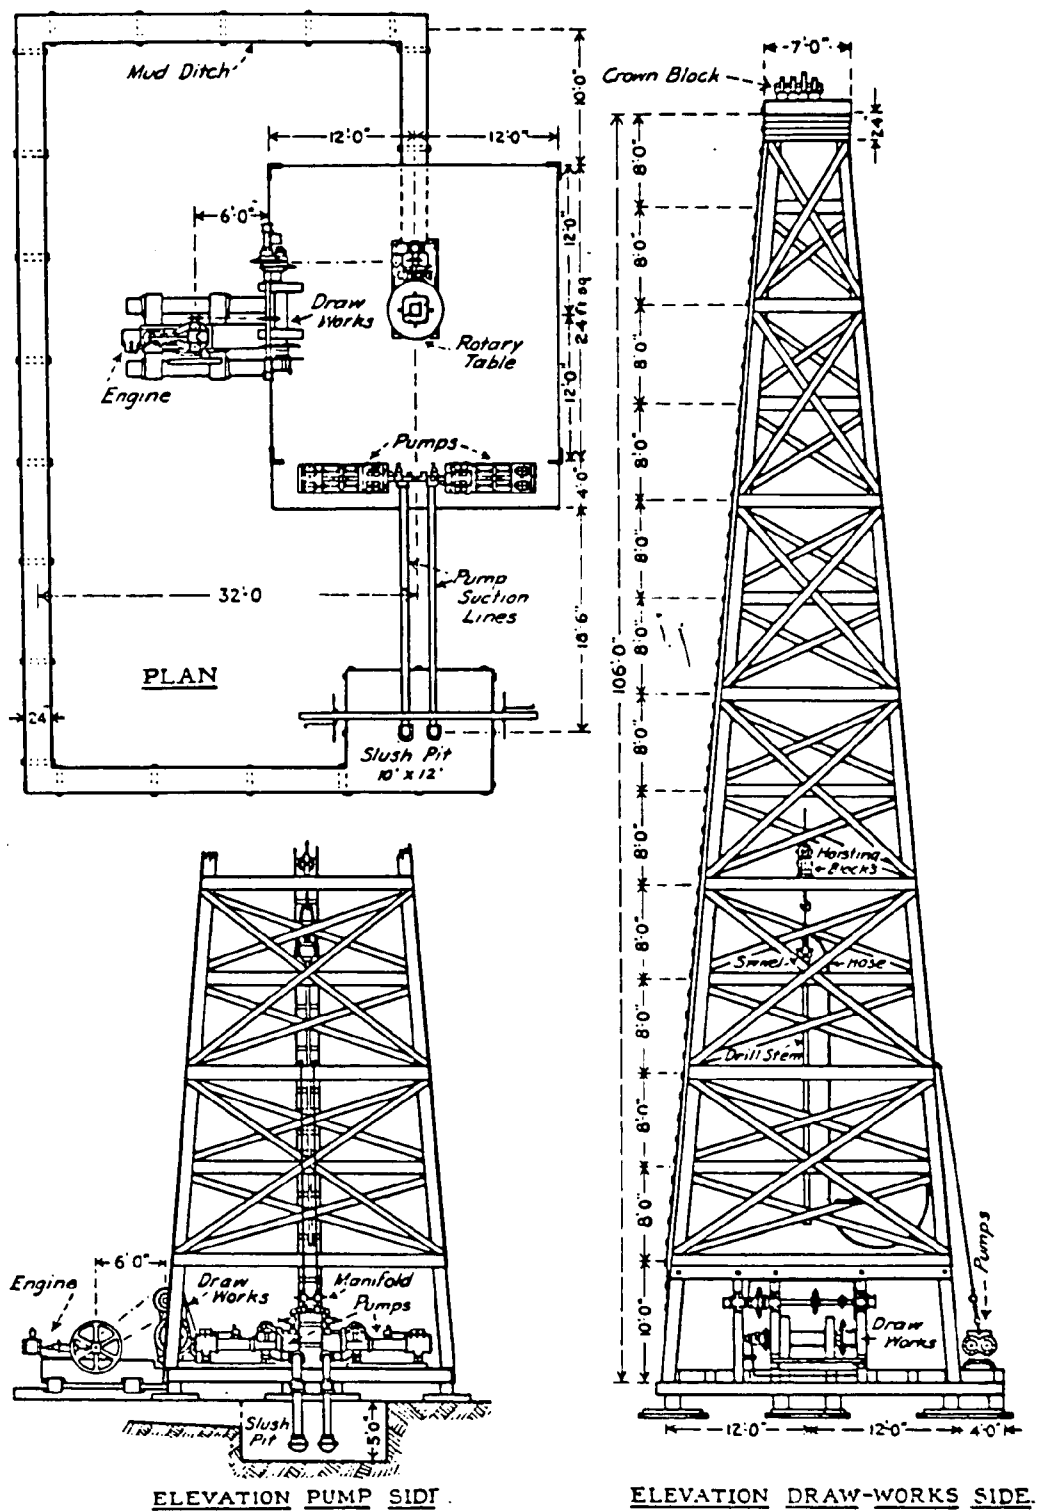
Plan and elevation of a 100-foot rotary rig (Uren 1924).
